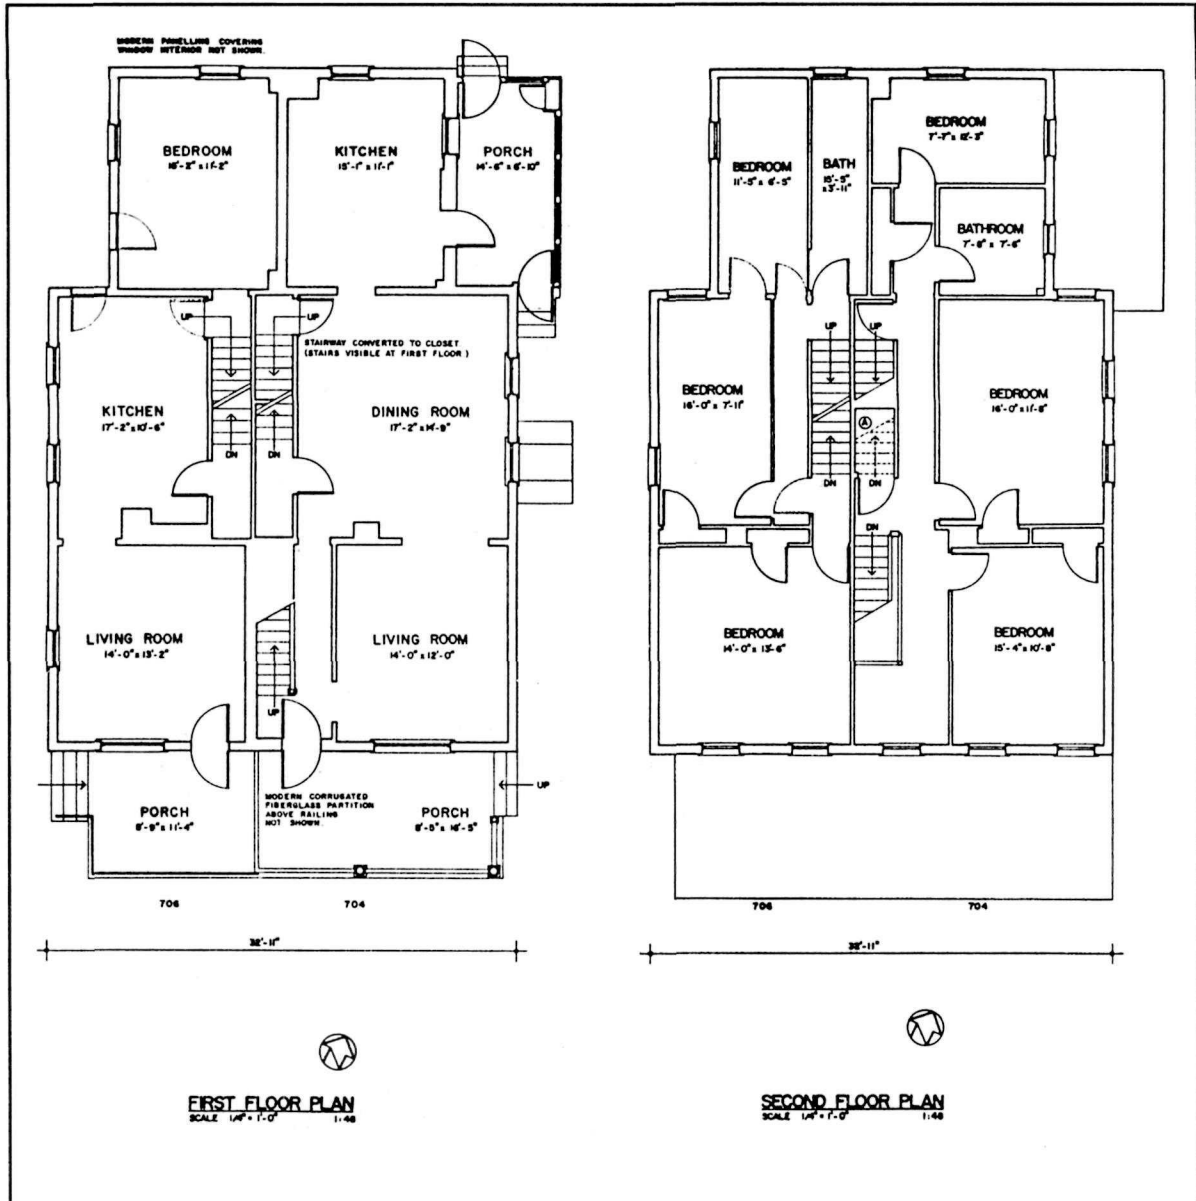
Isabel A. Davis House I, 704-06 Lexington Ave., first floor plan, drawn by Pat Reese; second floor plan, drawn by Paul J. Skeet; June 1989.
